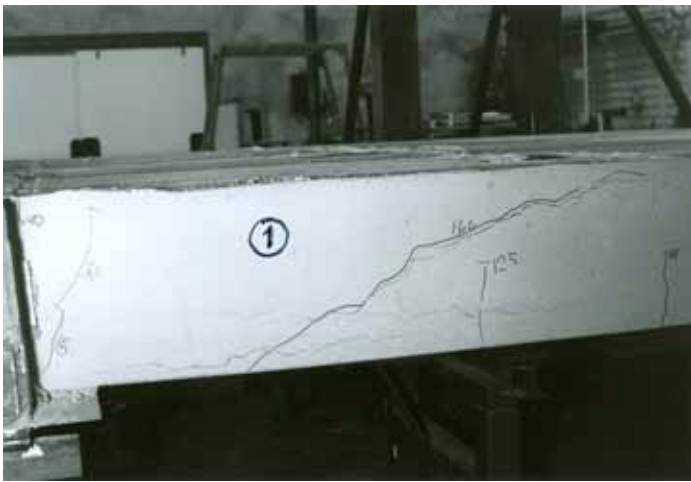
Cracking pattern of slab unit 1 after failure of slab units 5–8.
